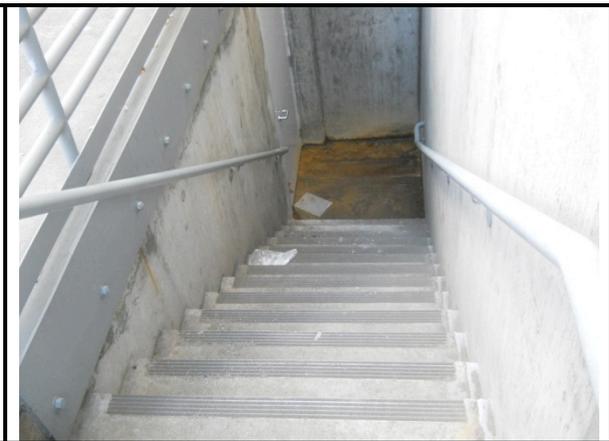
Clogged drain, standing water at bottom of rear stairwell.
